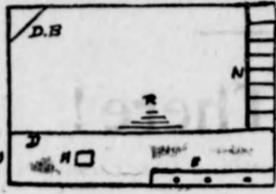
GROUND PLAN OF POULTRY HOUSE.
